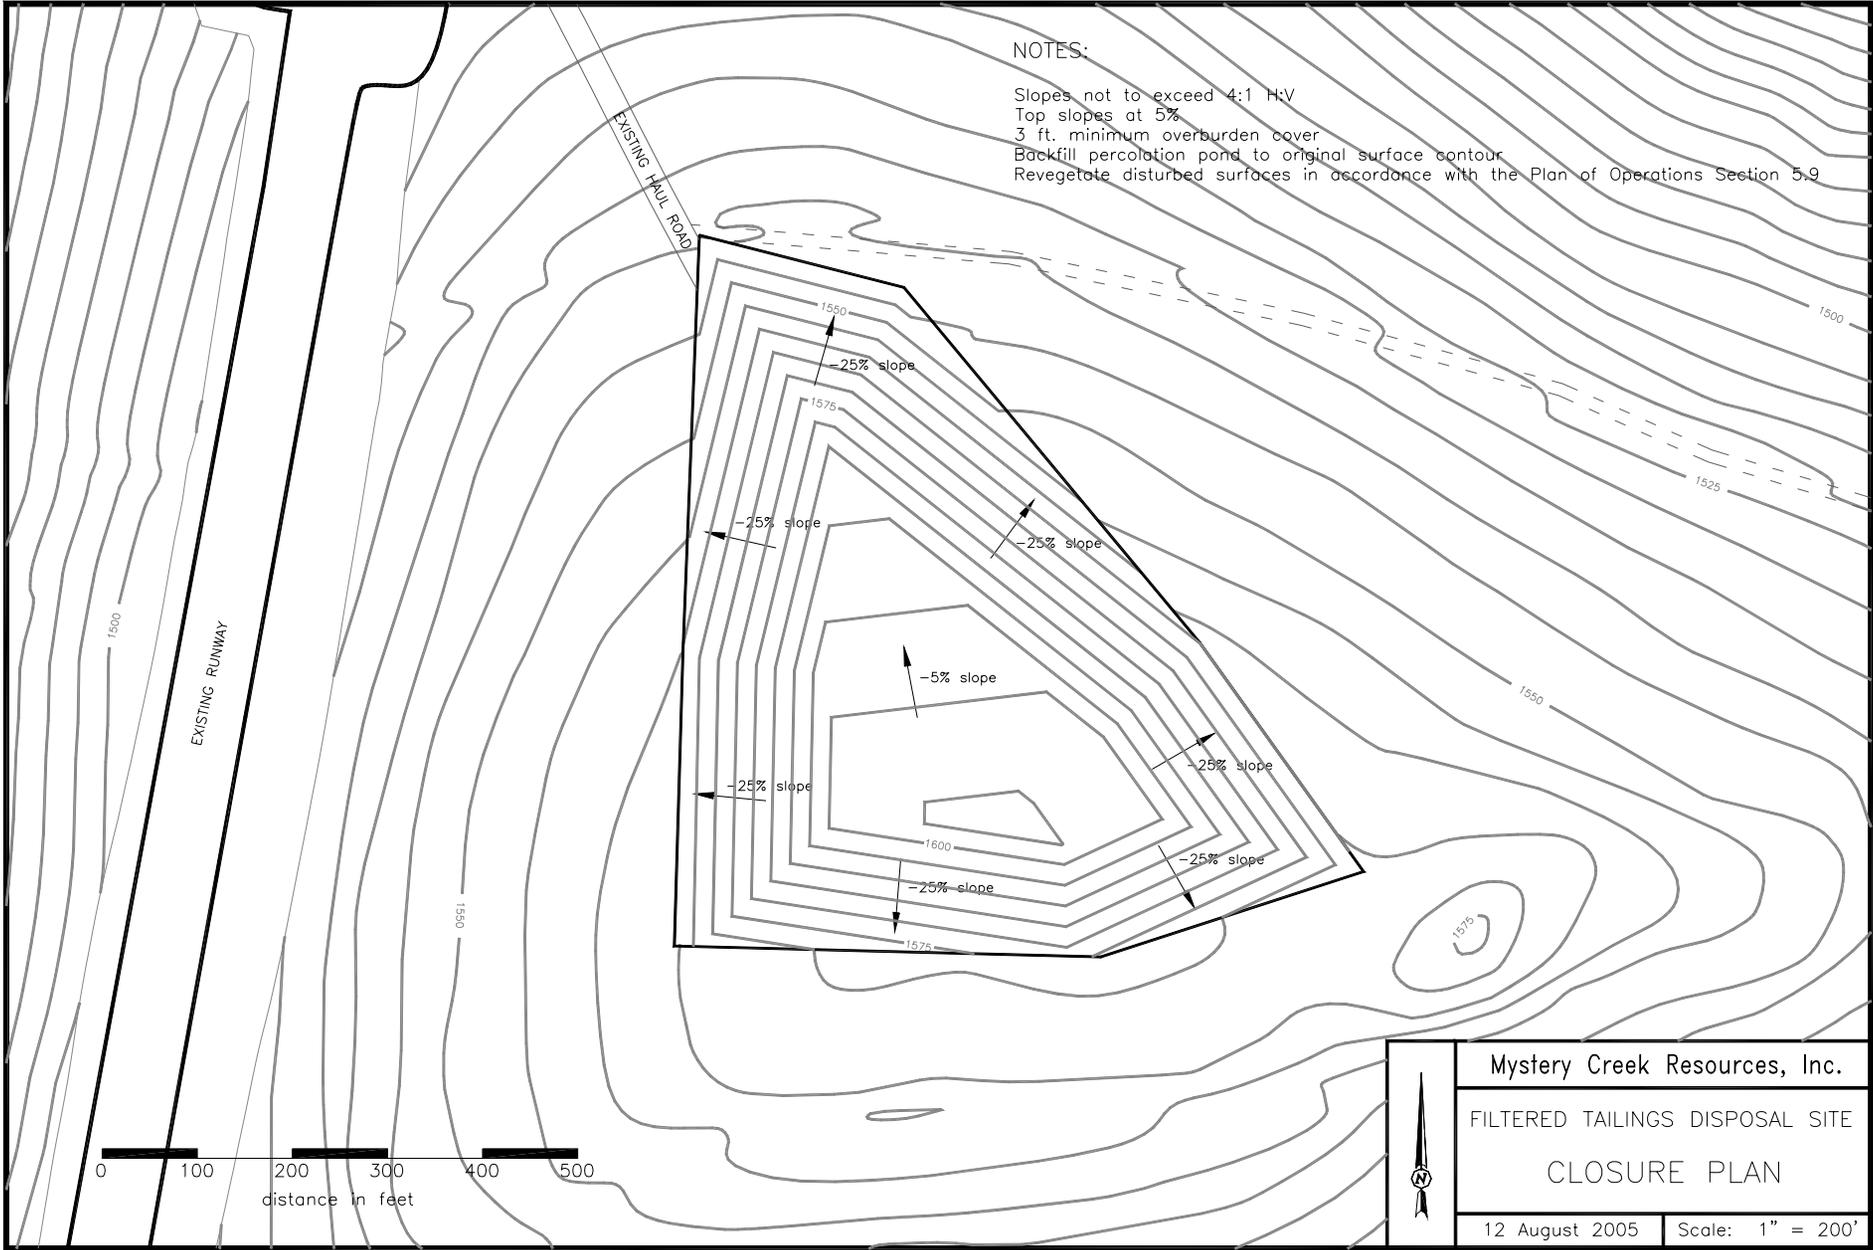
FILTERED TAILINGS DISPOSAL SITE CLOSURE PLAN
